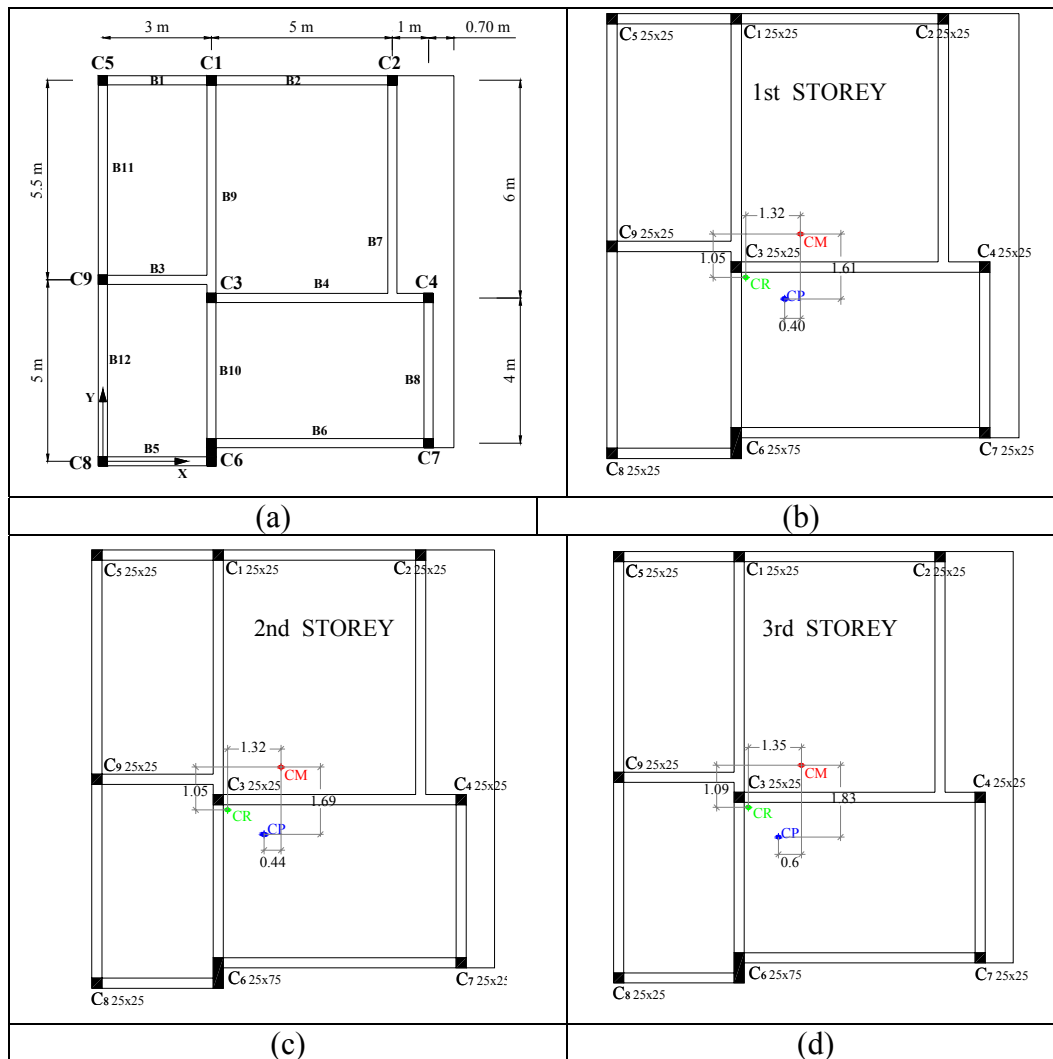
‘As-built’ structure: Plan layout (a), centre of stiffness and strength eccentricity at 1st (b) and 2nd storey (c) and at 3rd storey (d)
